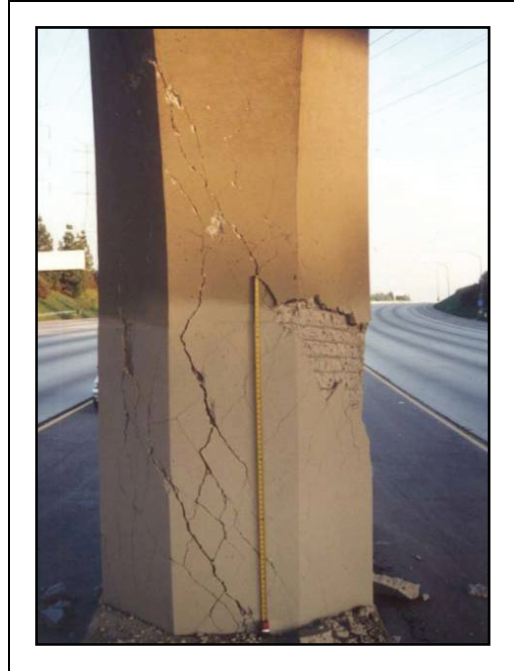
Minor Damage: Cracking and Spalling of the Concrete Cover at the Column Base (KTC)
